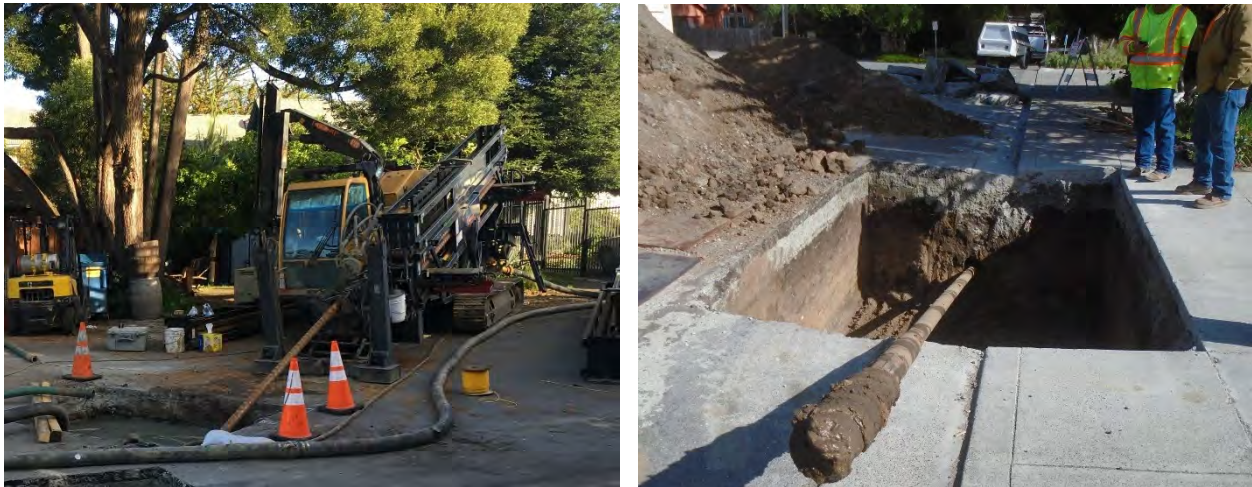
HDD drill rig installing pilot bore [Left]; Pilot bore drill bit at exit pit [Right]
